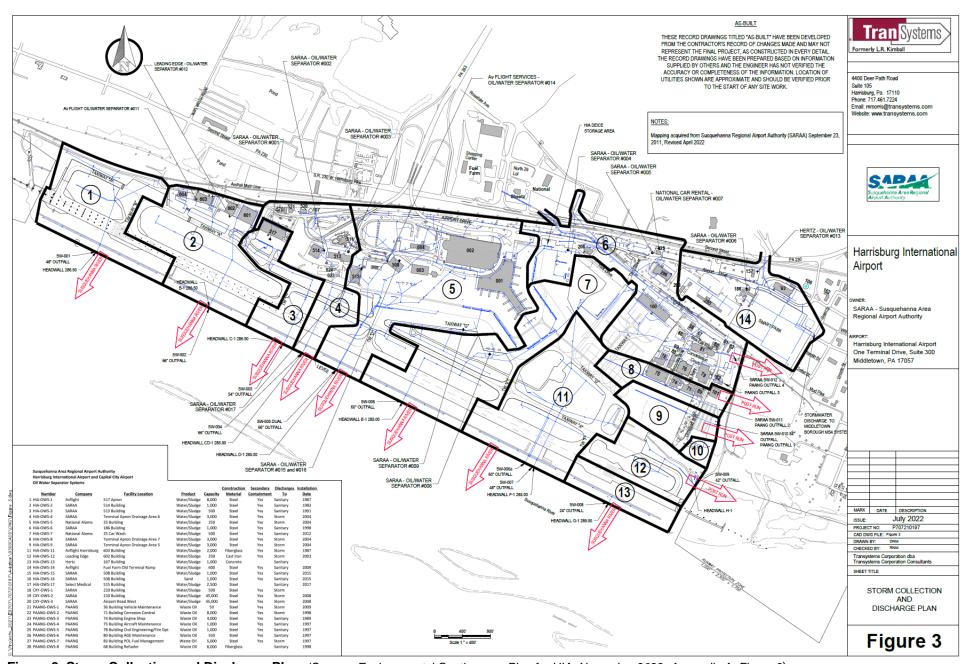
Storm Collection and Discharge Plan. (Source: *Environmental Contingency Plan for HIA, November 2022, Appendix A, Figure 3*). Note: numbers on map correspond to drainage areas not Outfalls (See Table 1 referencing the Storm Collection area draining to each outfall).
